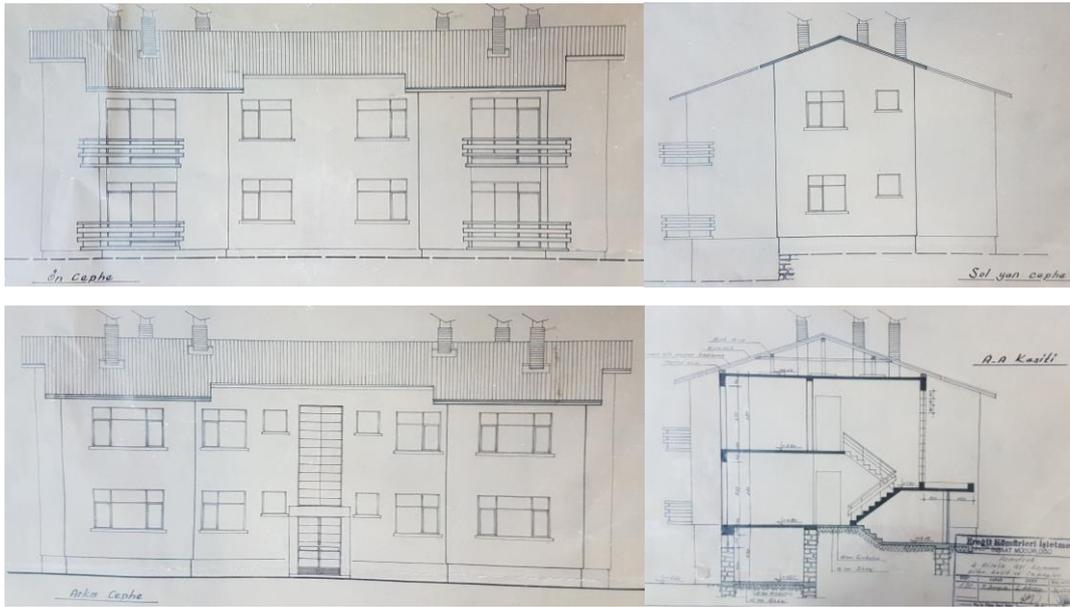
The elevation and section drawings of the four-family apartment (Source: TTK Archive, 2020)
